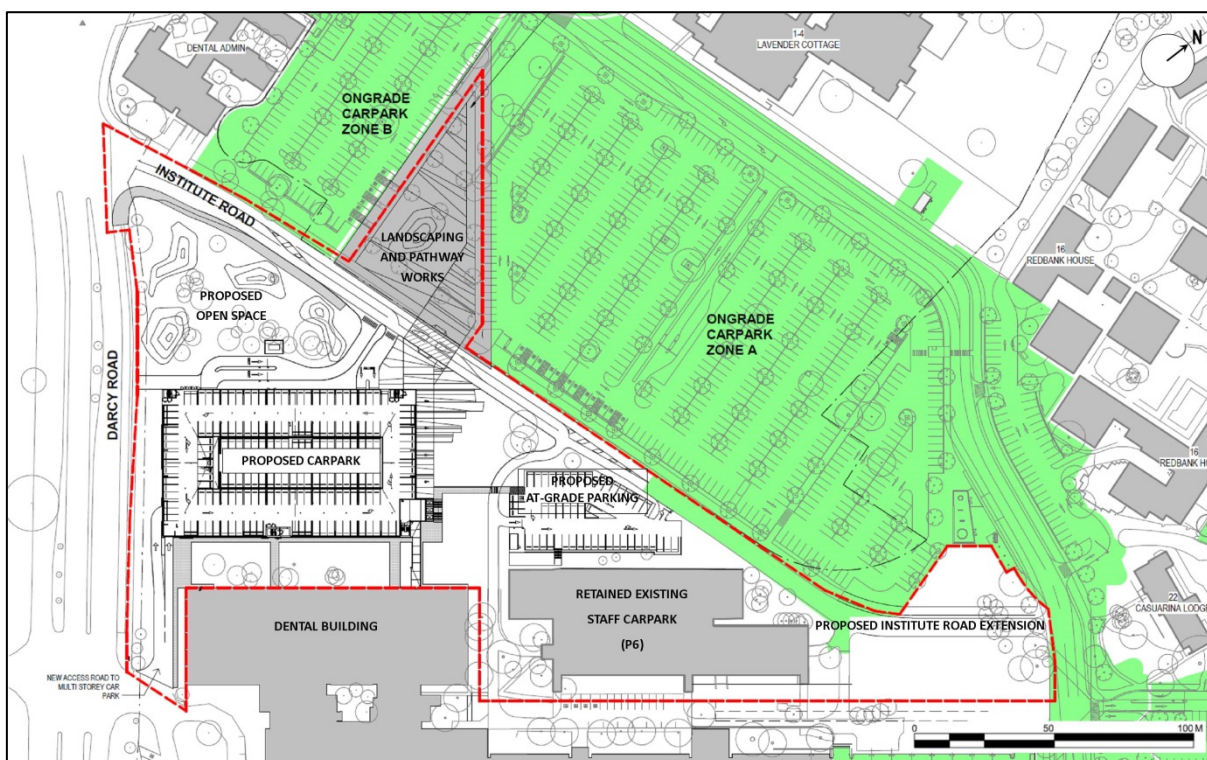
Proposed site layout (red line indicating extent of works) (source: applicant's Rts)
